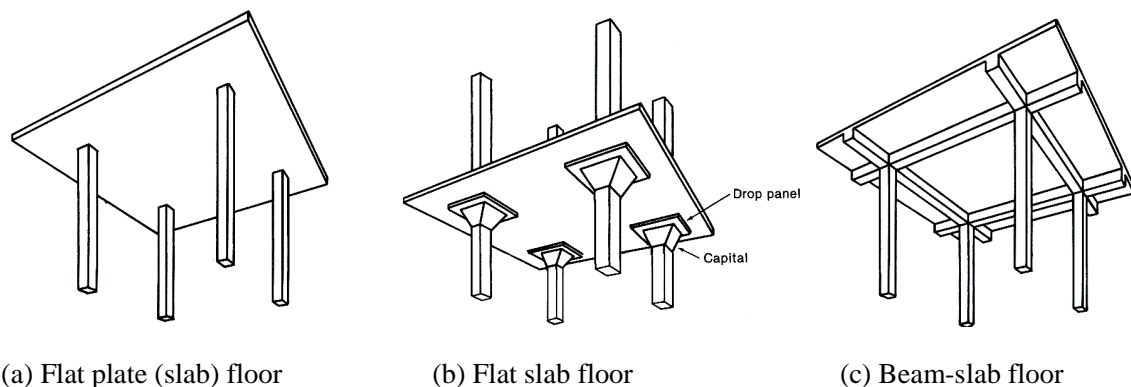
Flat slab (plate) floor and beam-slab floor (adapted from MacGregor and Bartlett, 2000)
